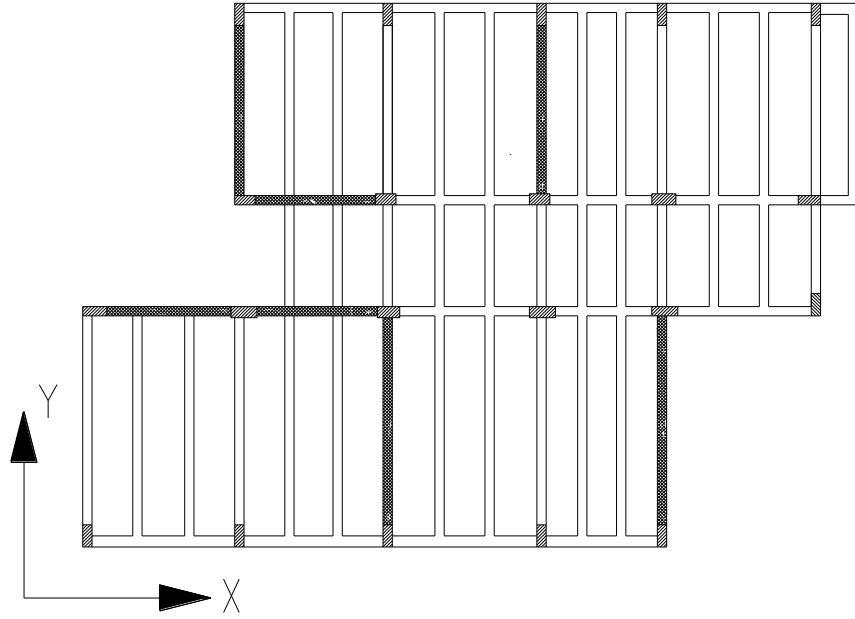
Plan View of the Retrofitted Case of Eminönü Çemberlitaş Anatolian High School Block A
